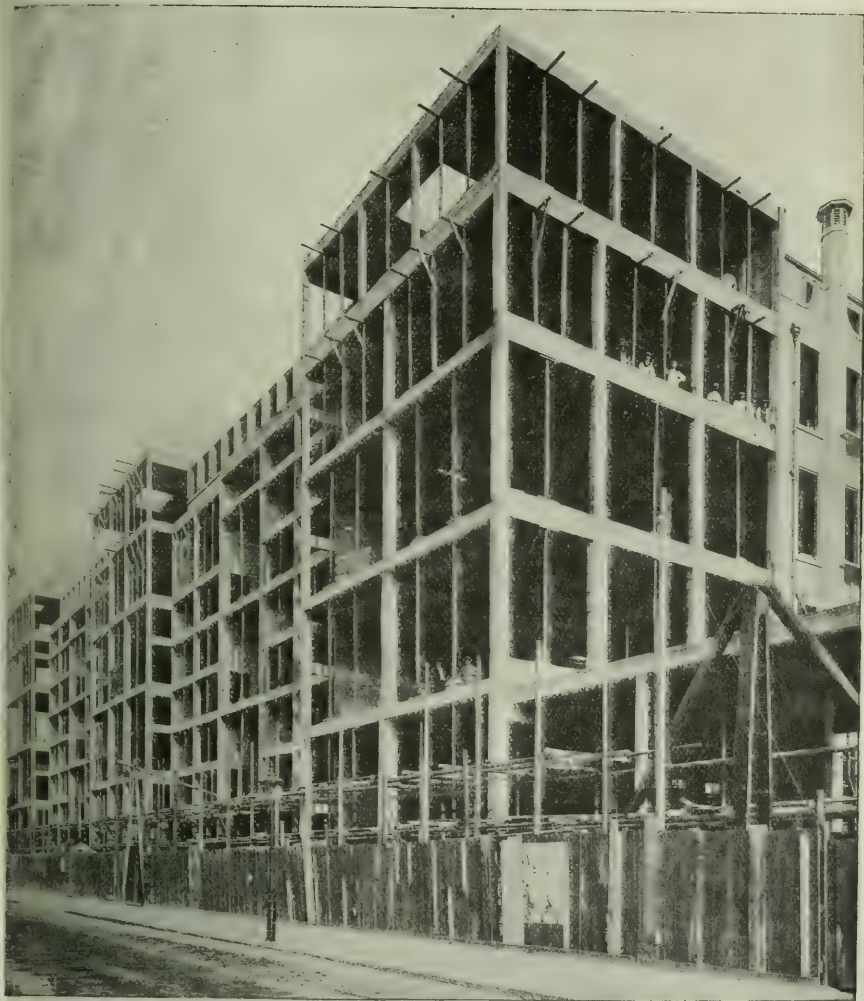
Reinforced Concrete Elevation of Holloway Money Order Department.
